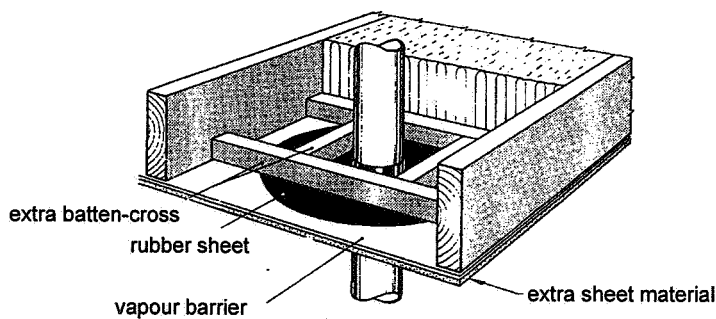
The figure shows how to achieve airtightness around a service penetration [3]. A rubber sheet is surrounded the pipe. The hole in the rubber sheet should be smaller than the dimension of the pipe. In this way the rubber sheet will surround the pipe airtight. The vapour barrier in the ceiling is clamped with the rubber sheet and pressed with a sheet material to the extra "batten-cross".
